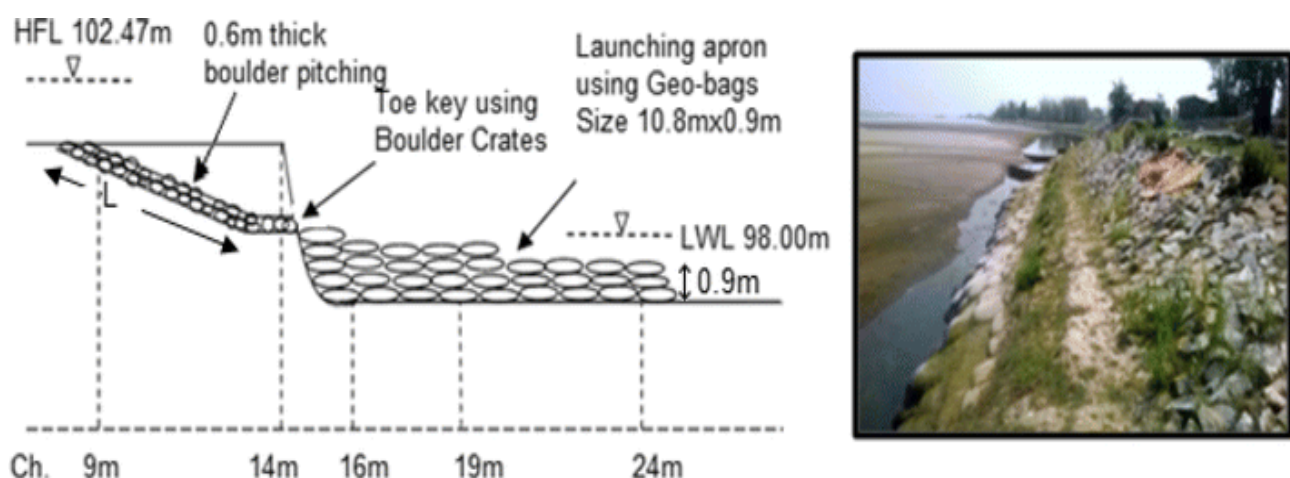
TECHNICAL DETAILS OF THE BANK PROTECTION WORK INSTALLED BY WATER RESOURCES DEPARTMENT ASSAM
